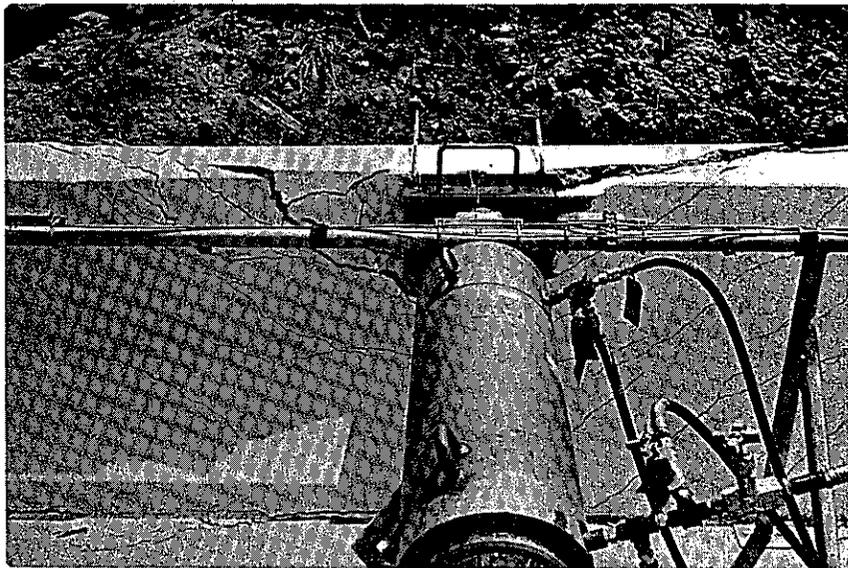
Close-up view of barrier face in Series II test showing crack pattern around bearing plate.
